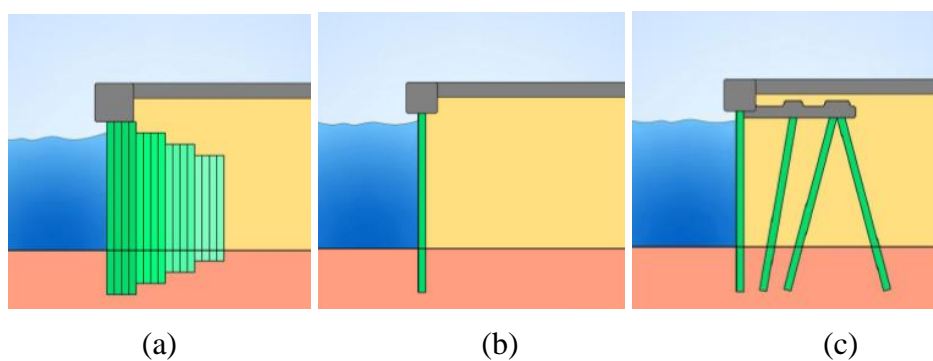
Sheet pile structures a) cantilevered sheet-pile b) anchored sheet-pile c) Sheet-pile with platform (PIANC [28])
